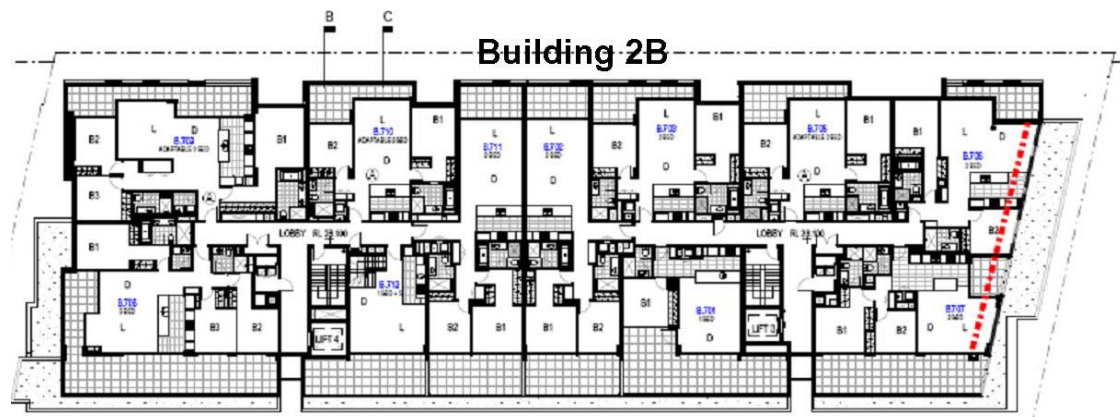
Building 2B – Level 7 - encroachment into southern setback area shown dashed.
